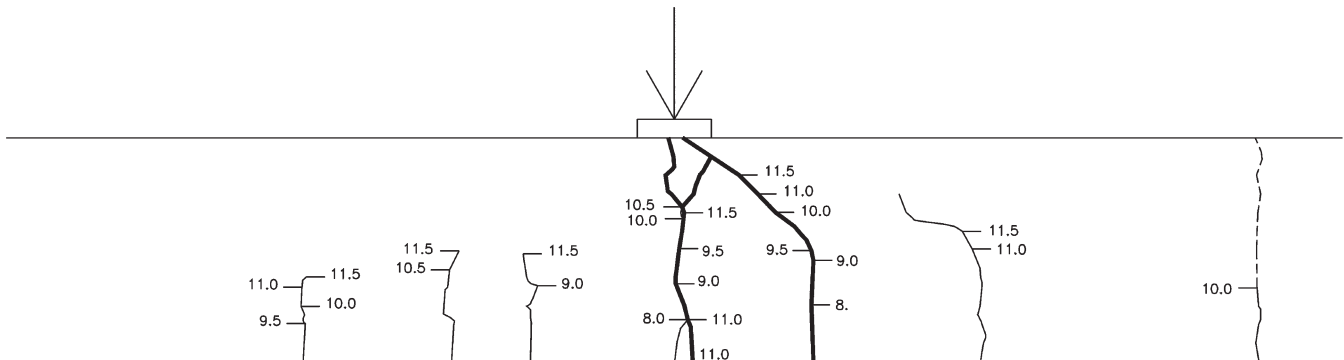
Crack patterns at failure of single-strand development length specimen 1S.
